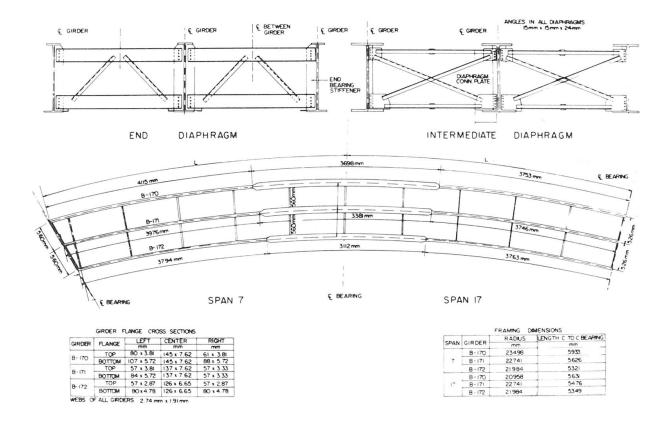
Framing Plan of Small Scale Seekonk River Bridge
